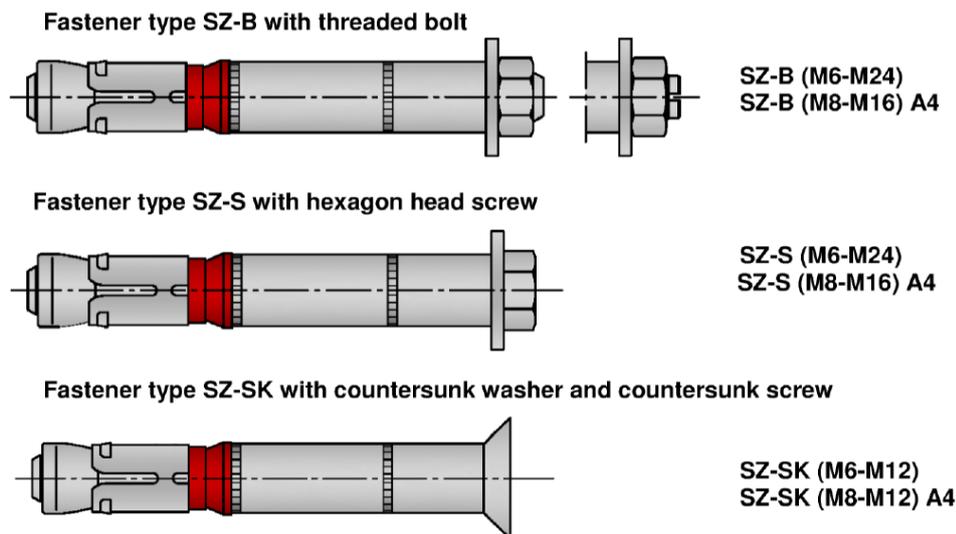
Schematic drawing of the anchors SZ for steel fiber reinforced concrete as different types SZ-B, SZ-S and SZ-SK.
